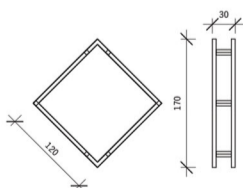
Detail: Kinetic armature and adjustable detail (Author. 2016)
